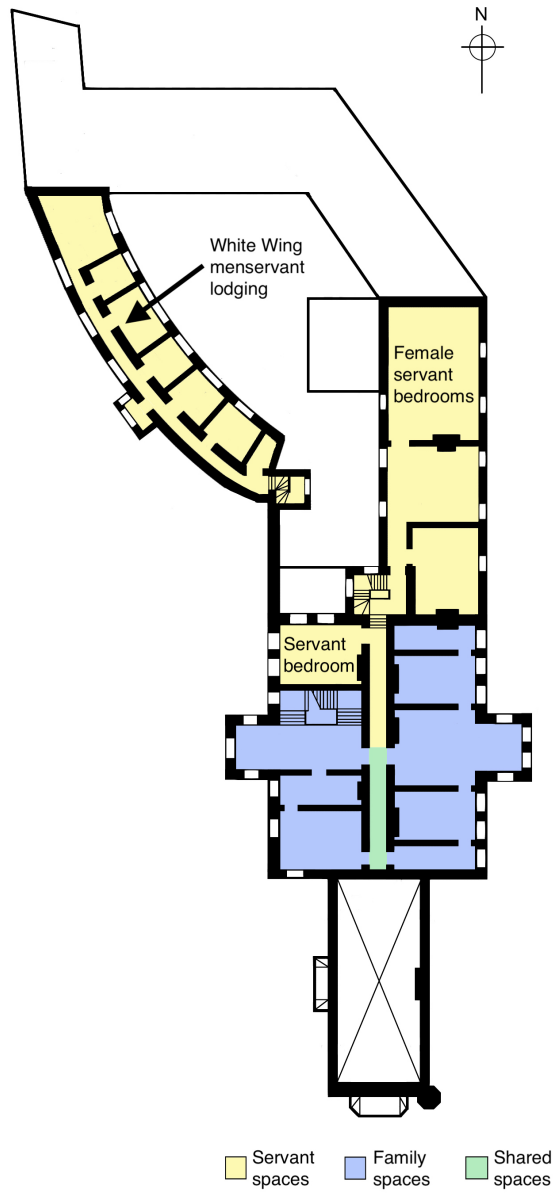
Kiplin Hall c1820 Phase 2 first floor plan
